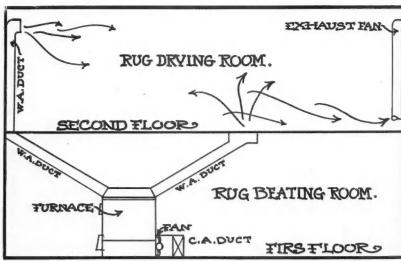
Elevation Showing the Method of Installing Furnace and Heat Ducts in the Building Shown in Fig. 1.
